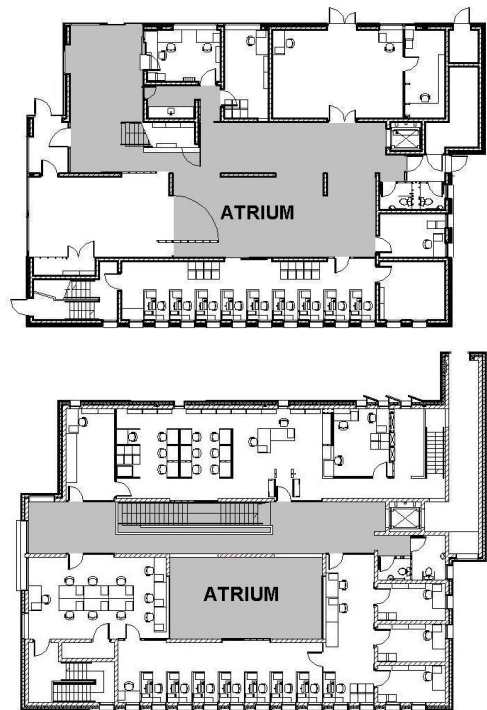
Ground floor (top) and first floor plans (bottom) of the UI building with areas of interest shaded.
